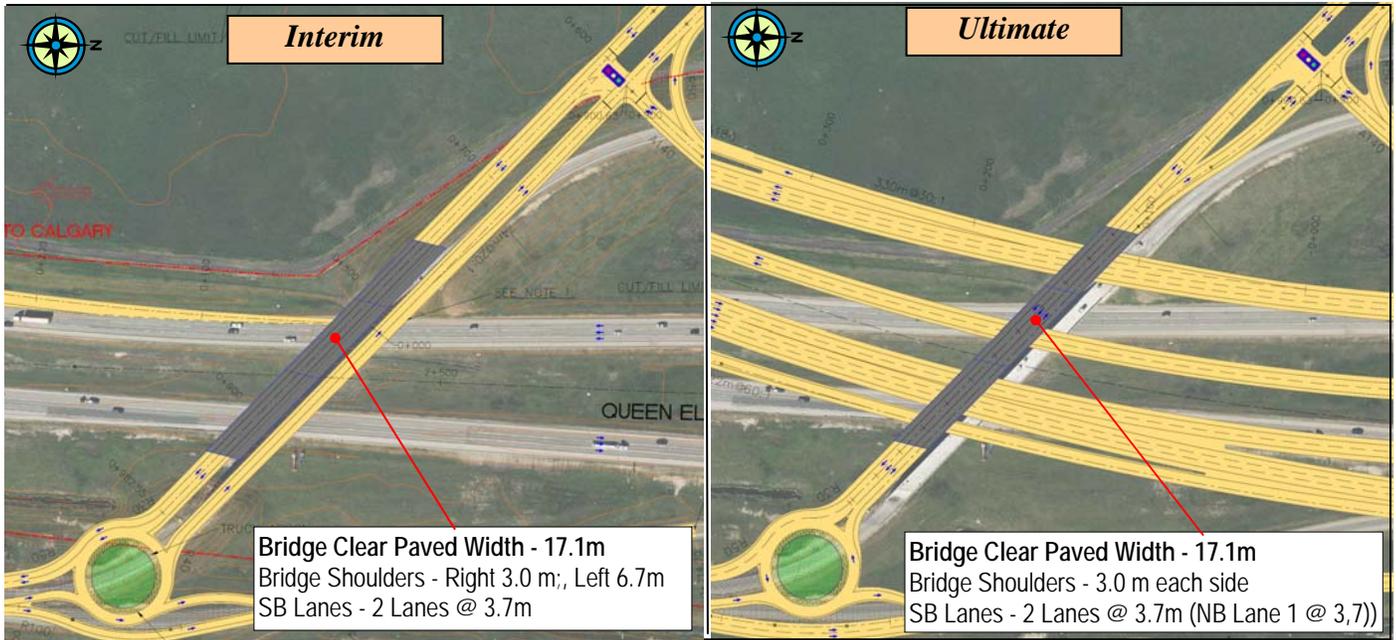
Three-Lane 50th Street Twin Bridge Concept.
